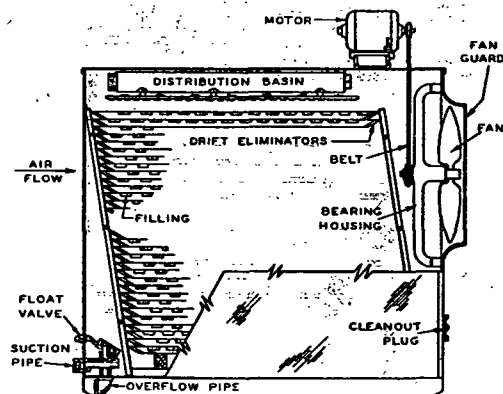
SMALL HORIZONTAL INDUCED DRAFT COOLING TOWER FOR 3 TO 50-TON REFRIGERATING UNITS
